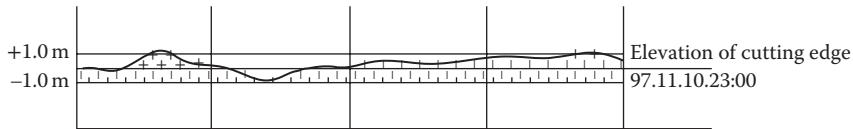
Elevation two—foot blade and riverbed (Wuhu Yangtze River Bridge double-wall steel cofferdam construction).
